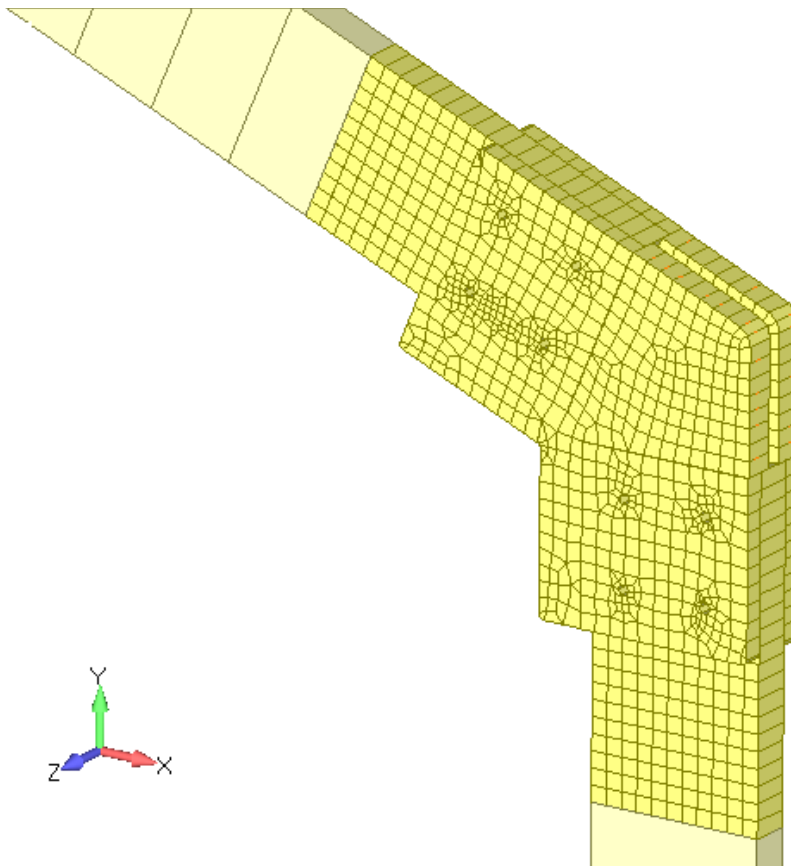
Finite element model of the joint of beam boards with connectors, angle 112.5 deg.
